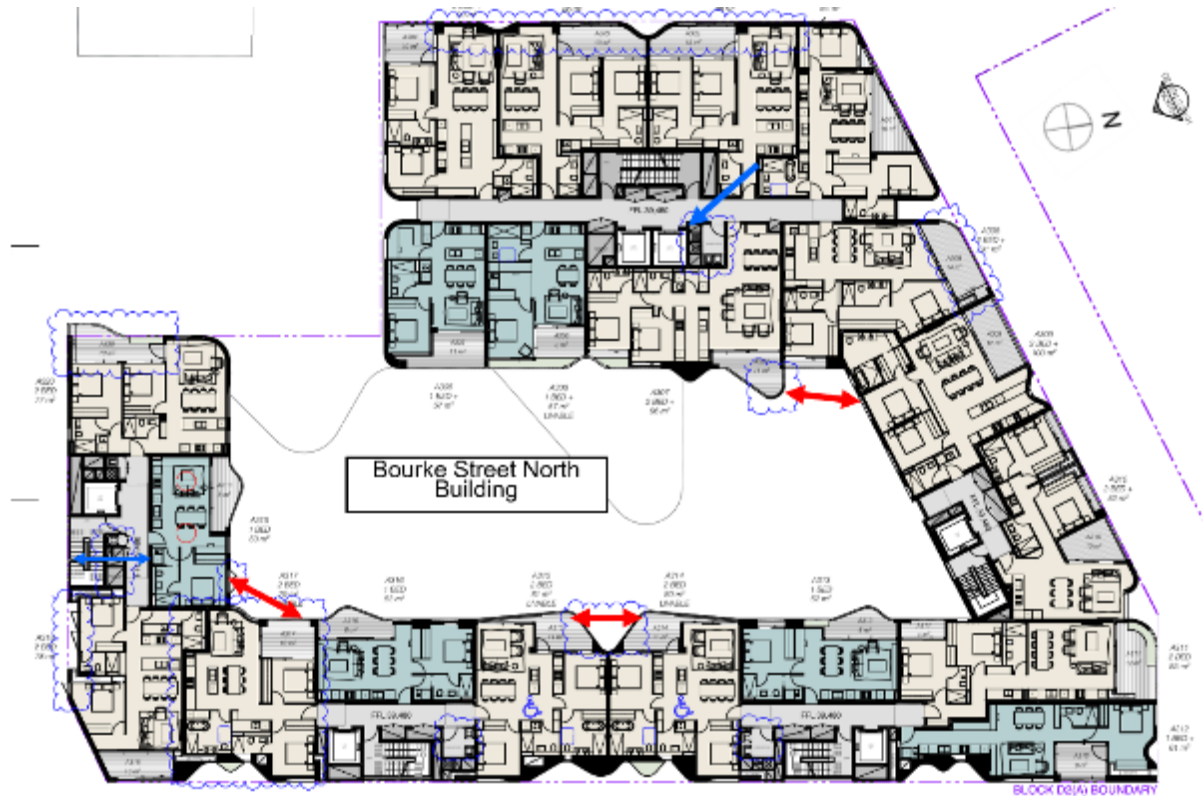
level 5 plan demonstrates that angled windows and privacy screens have been provided to prevent direct overlooking between neighbouring apartments (red arrows). Corridors are articulated with greater width.
